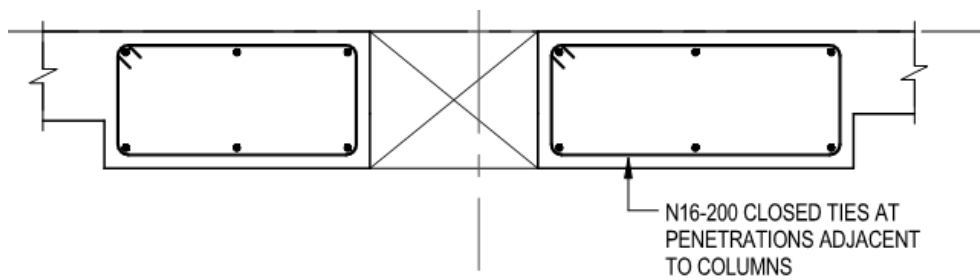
Allowance for future service riser zone adjacent to column – Alternative detail.
